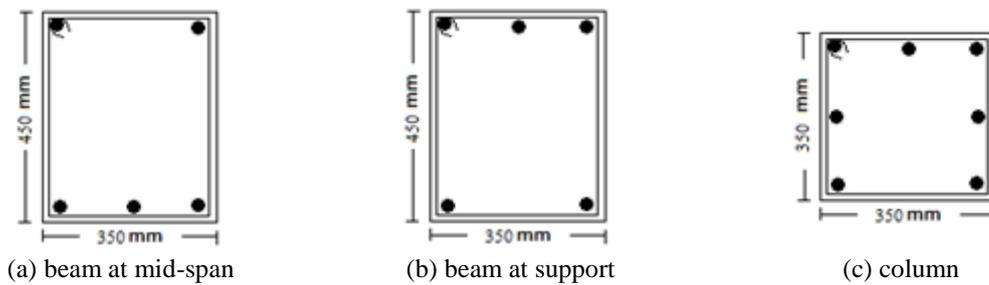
Cross-section and reinforcement details of members of RC frames exposed to fire
